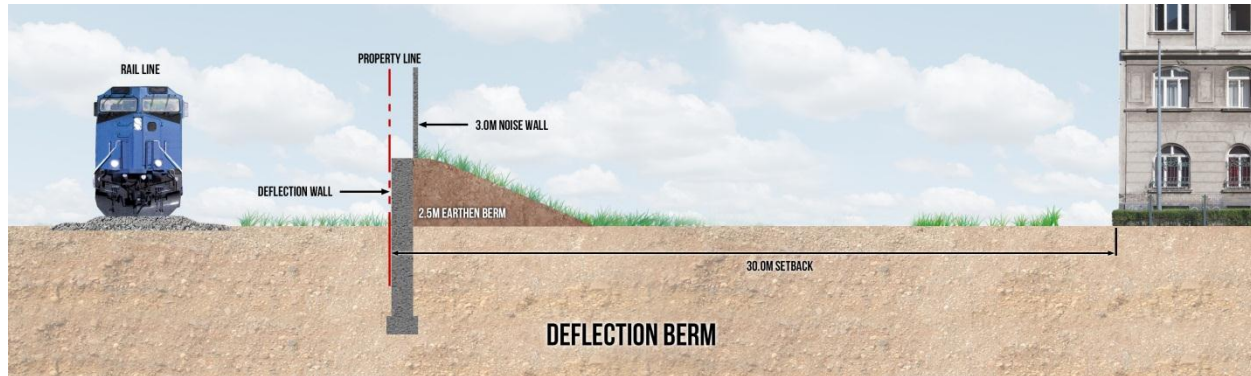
Deflection Berm (or Crash Berm) Plus 30 m Building Setback
